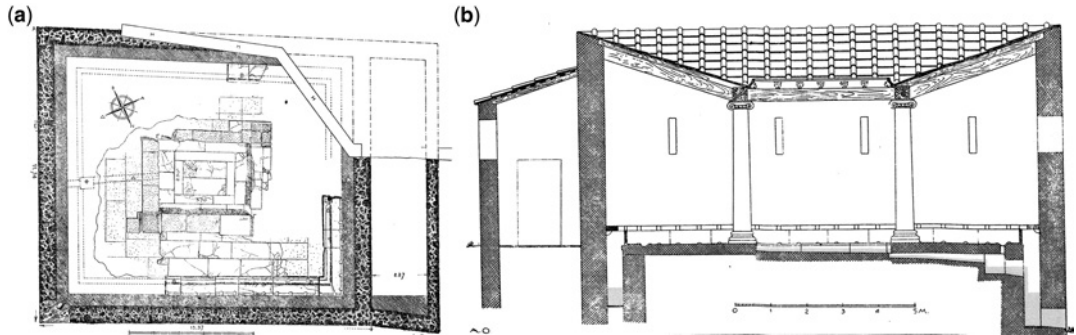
The lavatory outside Roman Agora, Athens: (a) plan and (b) restored longitudinal section (Orlandos, 1940).
